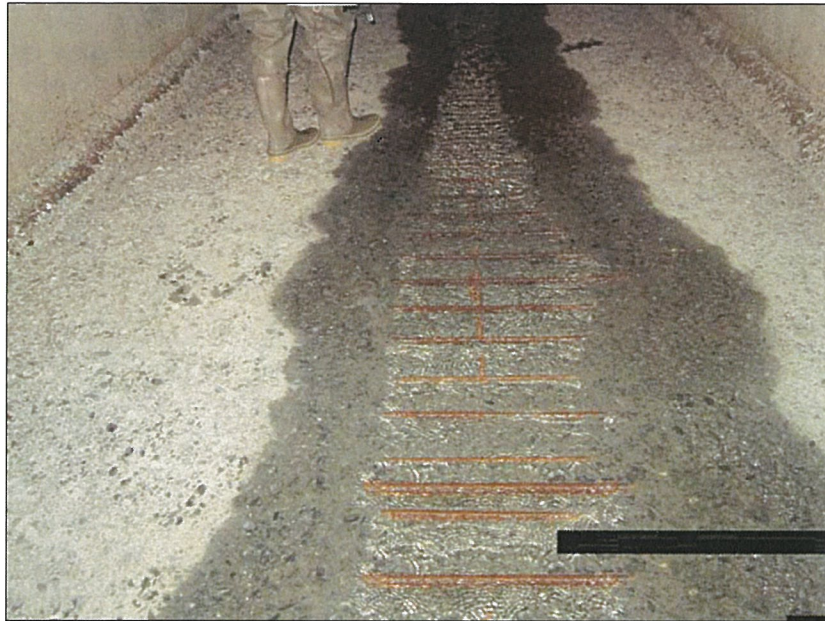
FLOOR OF EAST BAY AT STATION 300.
